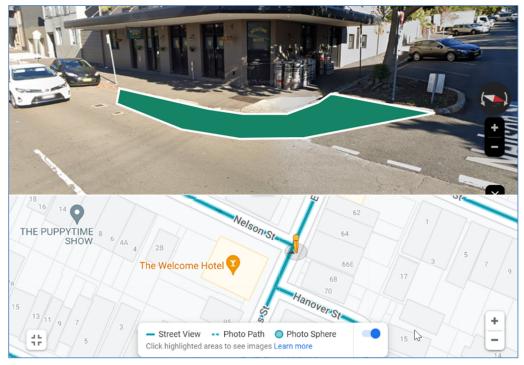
Potential kerb extensions at Nelson Street / Evans Street for further investigation.
